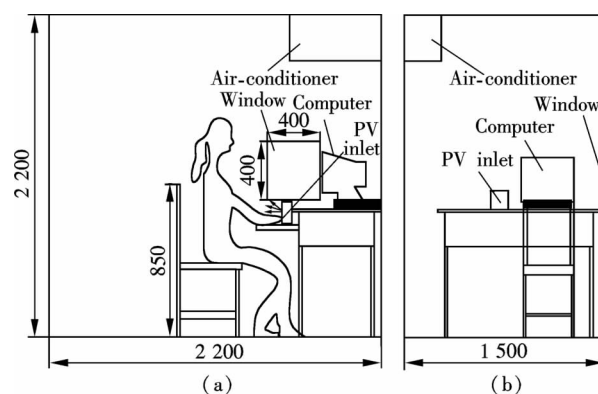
Layout of toll booth model (unit: mm). (a) Front view; (b) Side view
